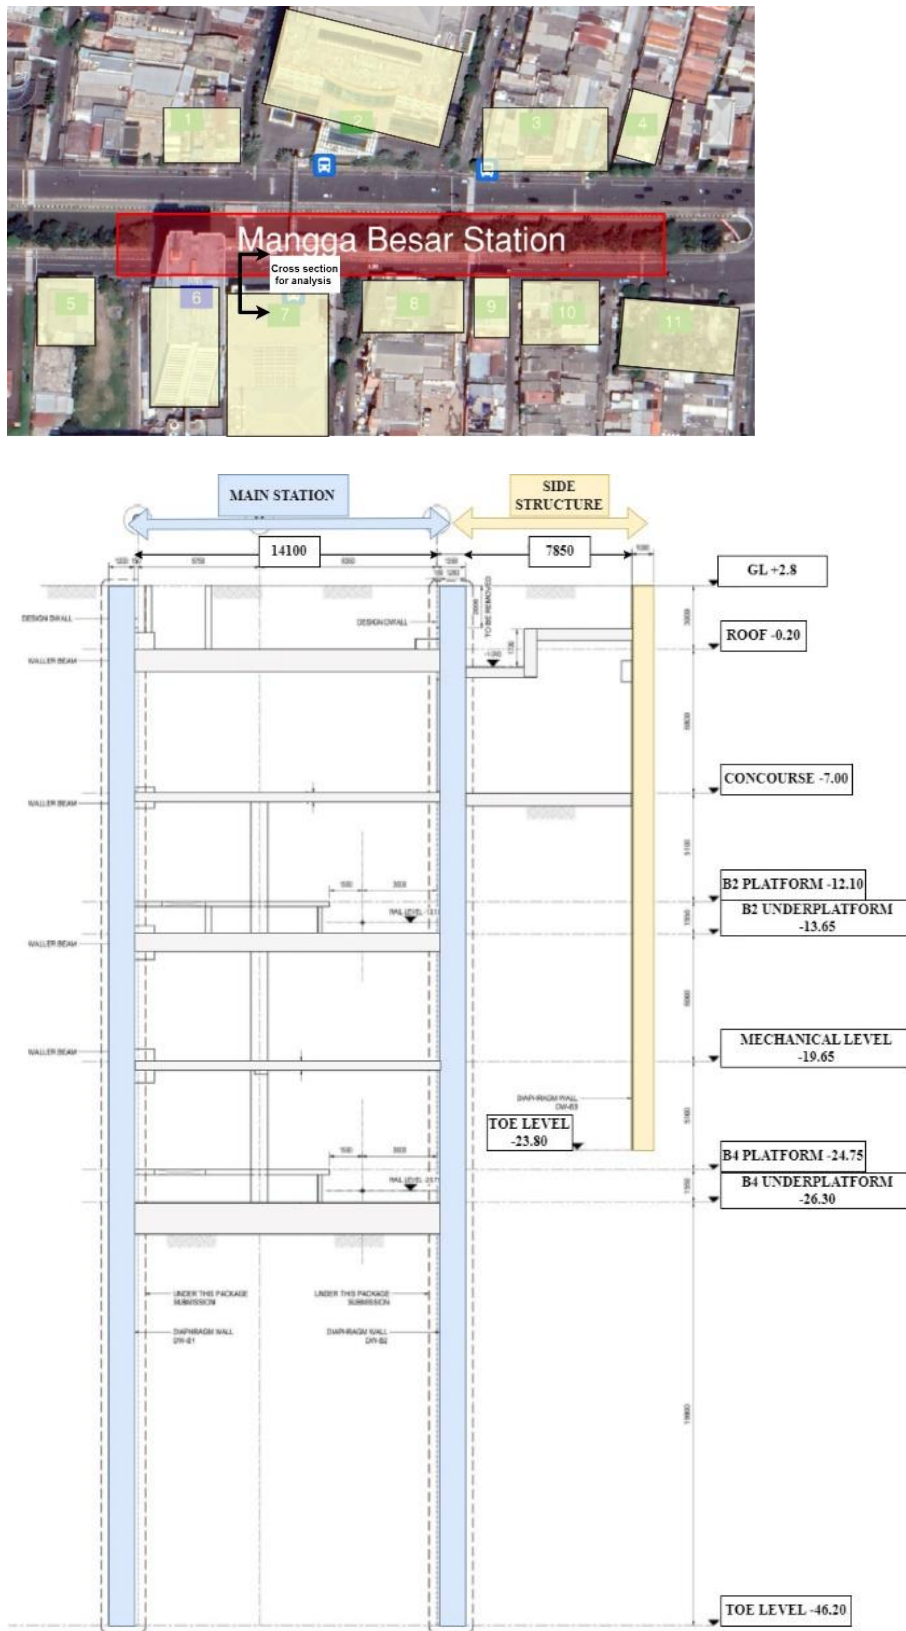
Plan view and cross section of Mangga Besar Station permanent structures
